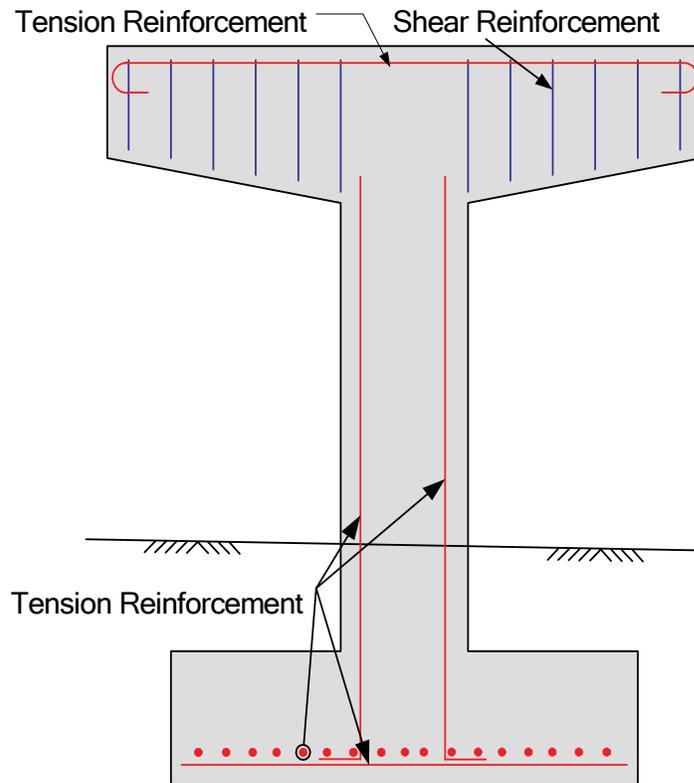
Primary Reinforcement for a Cantilevered Pier
